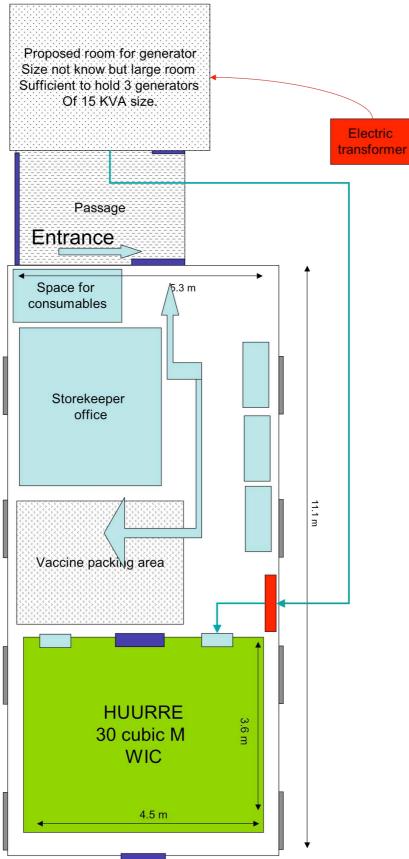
Proposed layout for Bolangir vaccine store and placement of 30 m³ WIC
